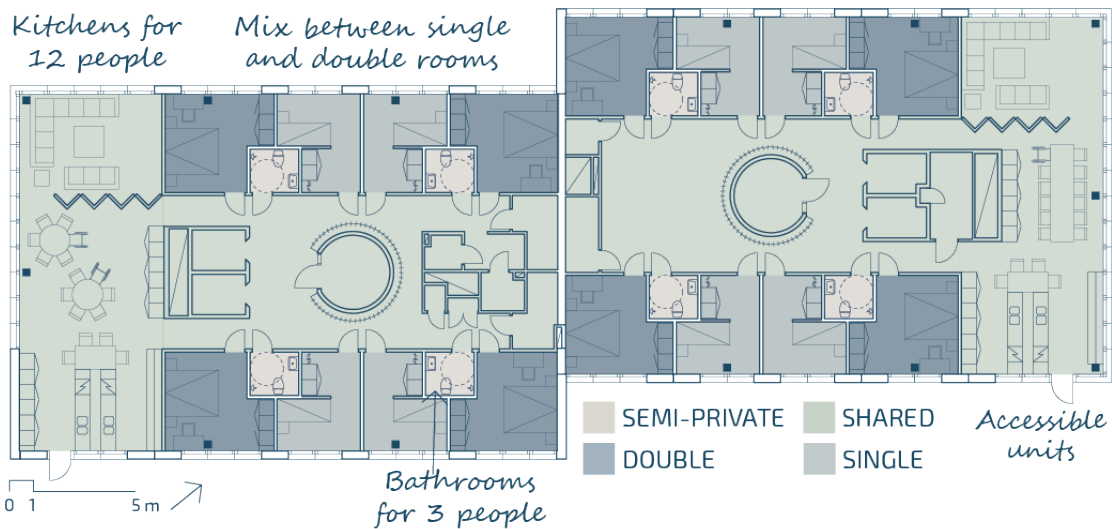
Floor plan for option Co-living - units of 3, adapted from Eriksson (2024)
